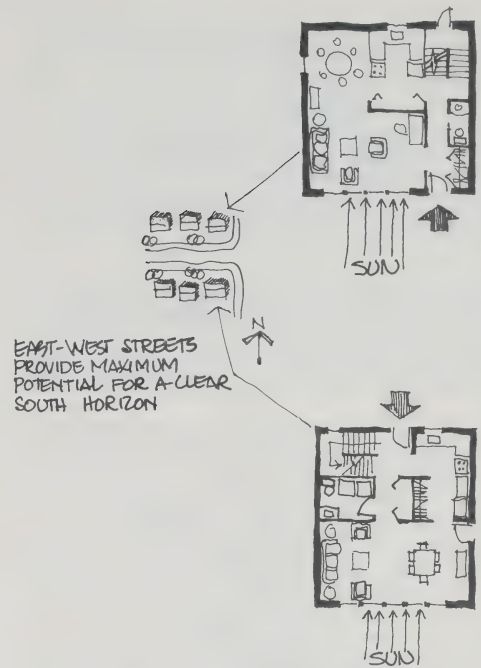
STREET ORIENTATION & ITS EFFECT ON FLOOR PLANS
